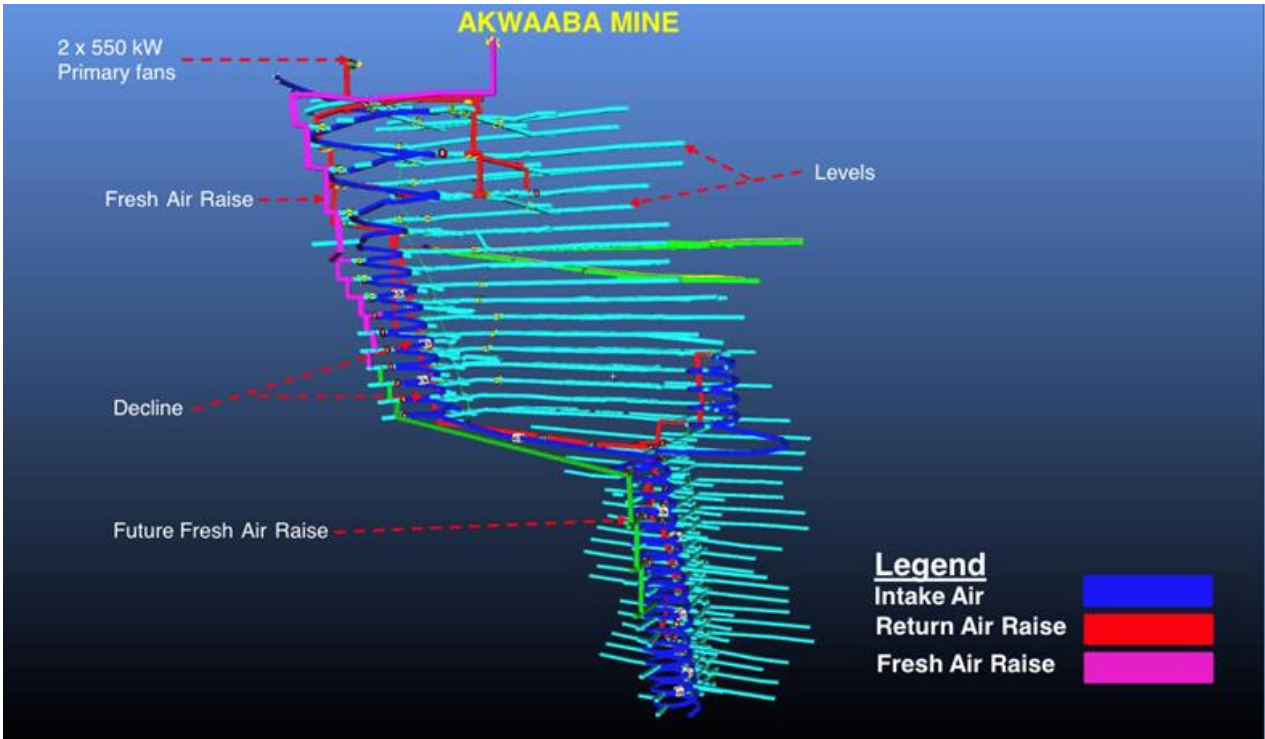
Isometric View of the Akwaaba Underground Ventilation Plan
